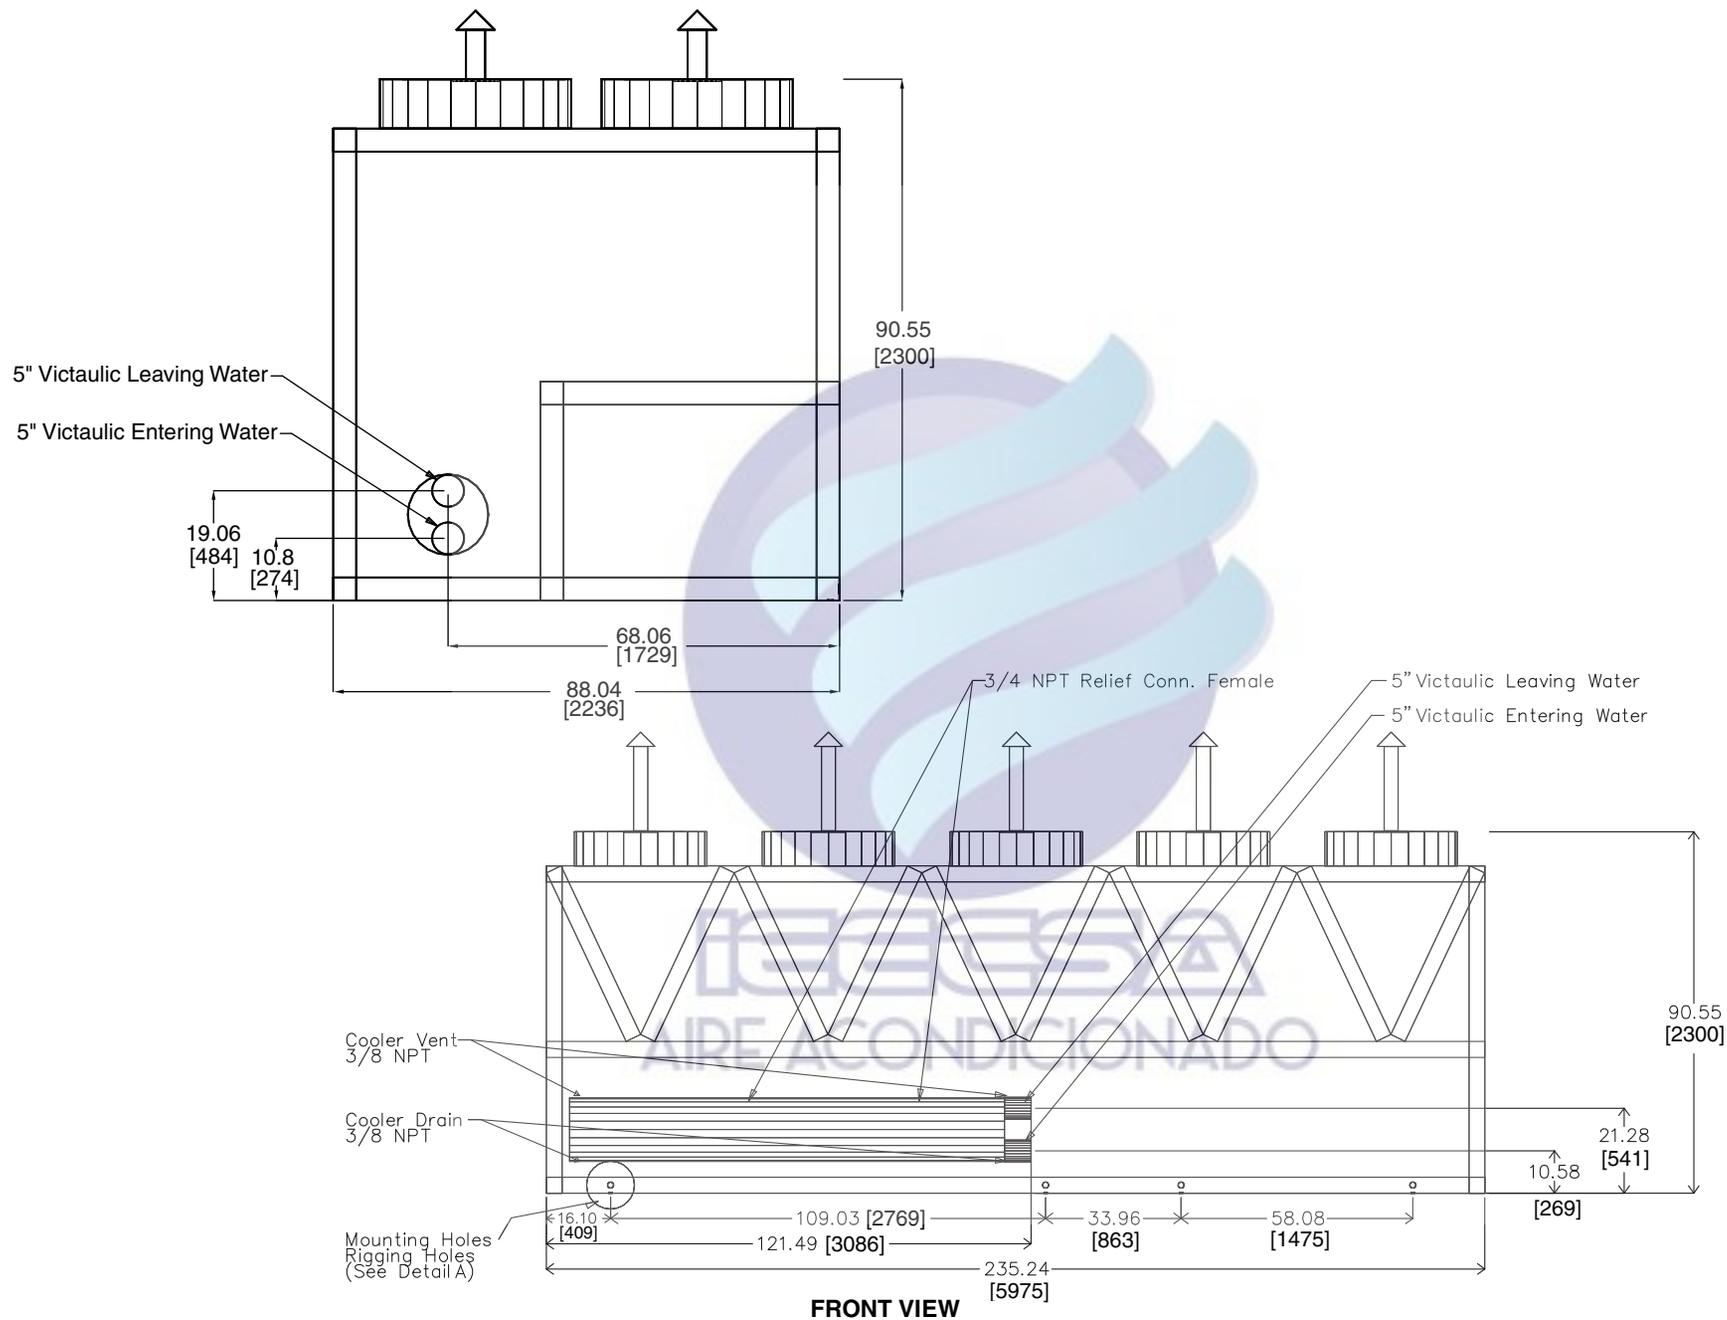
30XA140,160 Air-Cooled Liquid Chiller Dimensions without Pump (cont)
